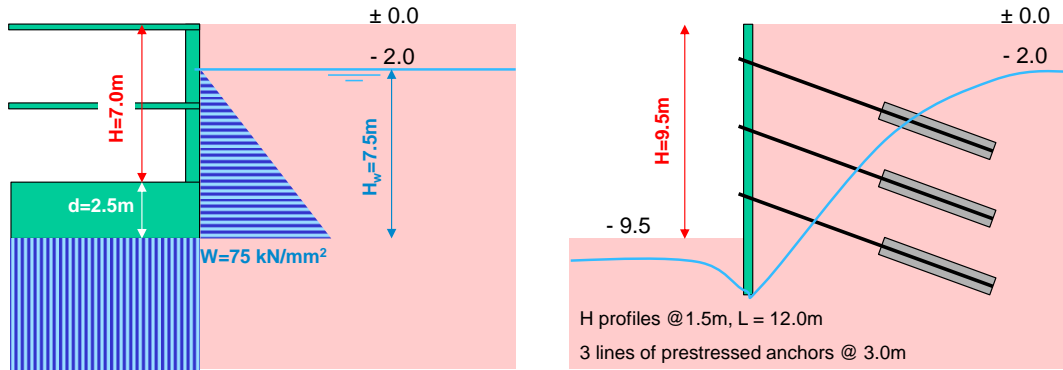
Preliminary design approach (left) and constructive measures for the temporary excavation shoring (right)
